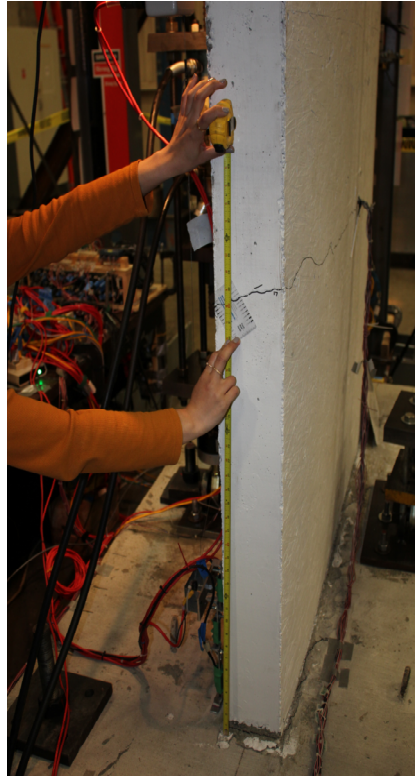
Wall Damage at 0.2% Drift
